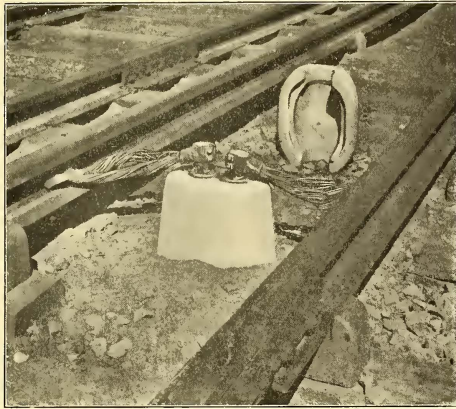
SINGLE THIRD-RAIL JUMPER
